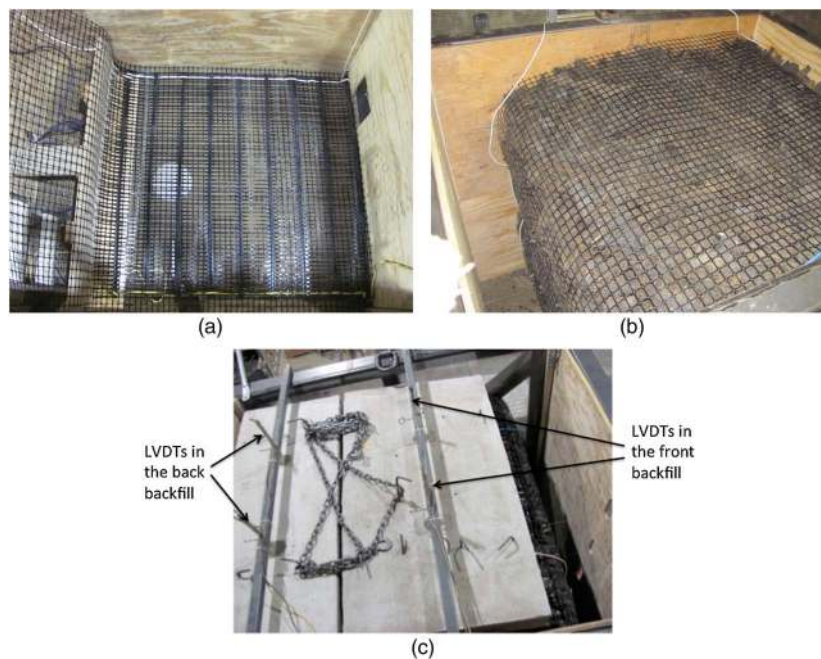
Geogrid reinforced wall construction: (a) construction of MSE wall (backfill is sand); (b) before the placement of concrete slab (backfill is TDA); (c) after the placement of concrete slab, which simulates the surcharge on the MSE wall
